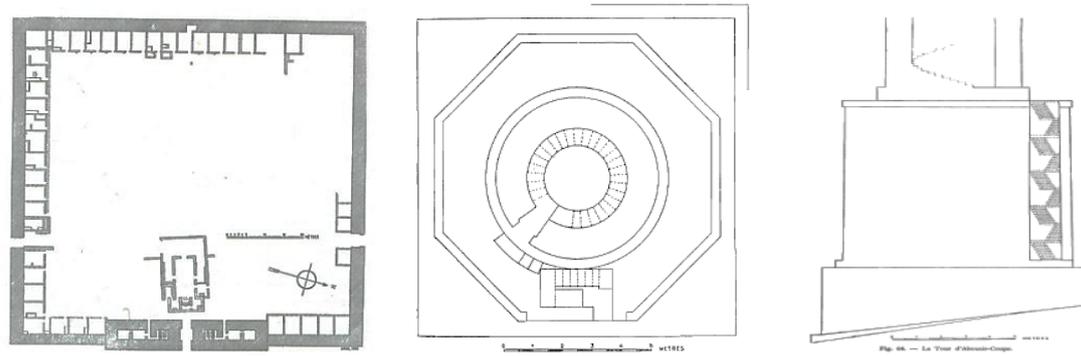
Adriani's design of the temple and tower ground plan.<sup>1</sup>
